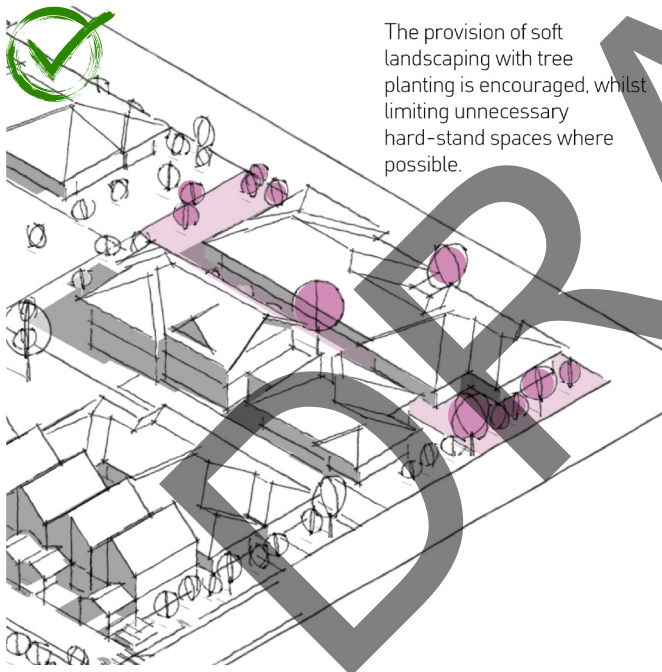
Single House and Grouped Dwellings - Landscaping Example Diagram
